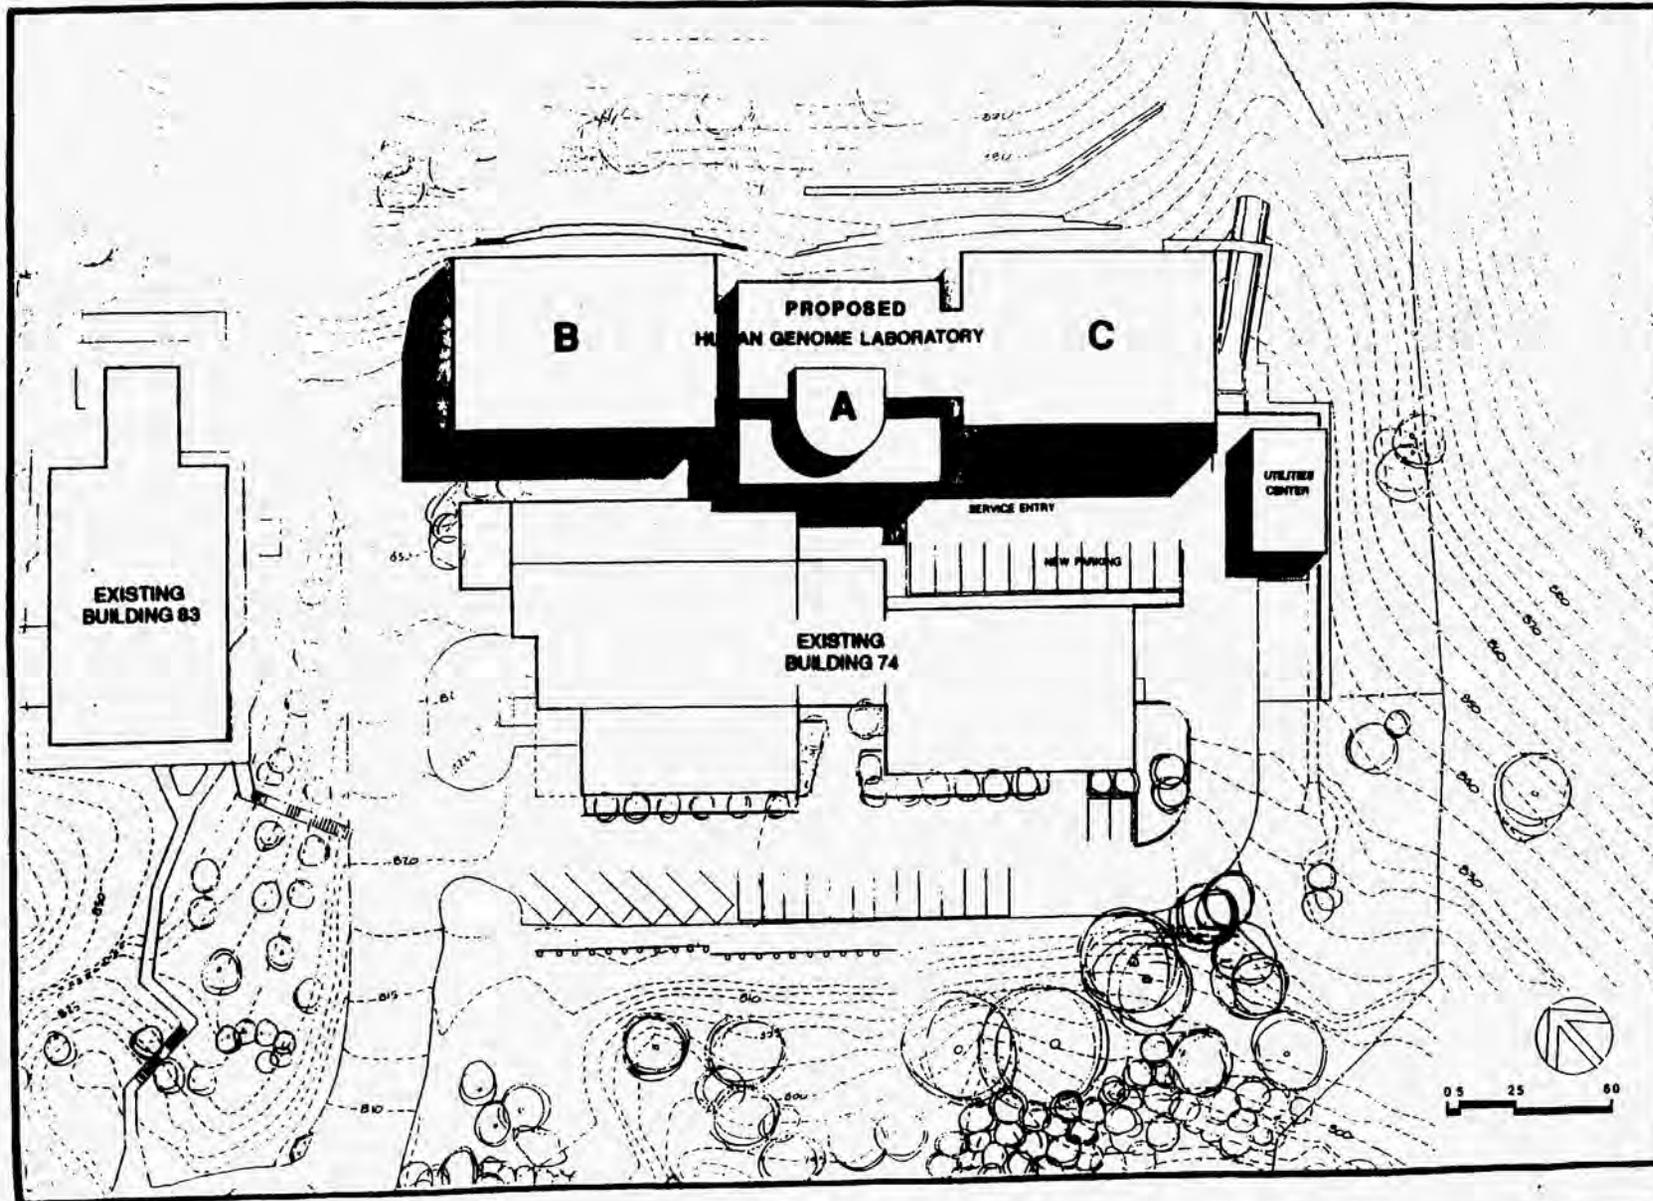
Layout of the Proposed Human Genome Laboratory in Relation to Existing Buildings
